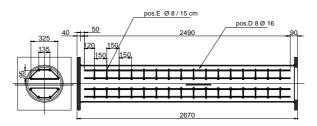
Column stub and reinforcements capable of hosting a through-column web plate
